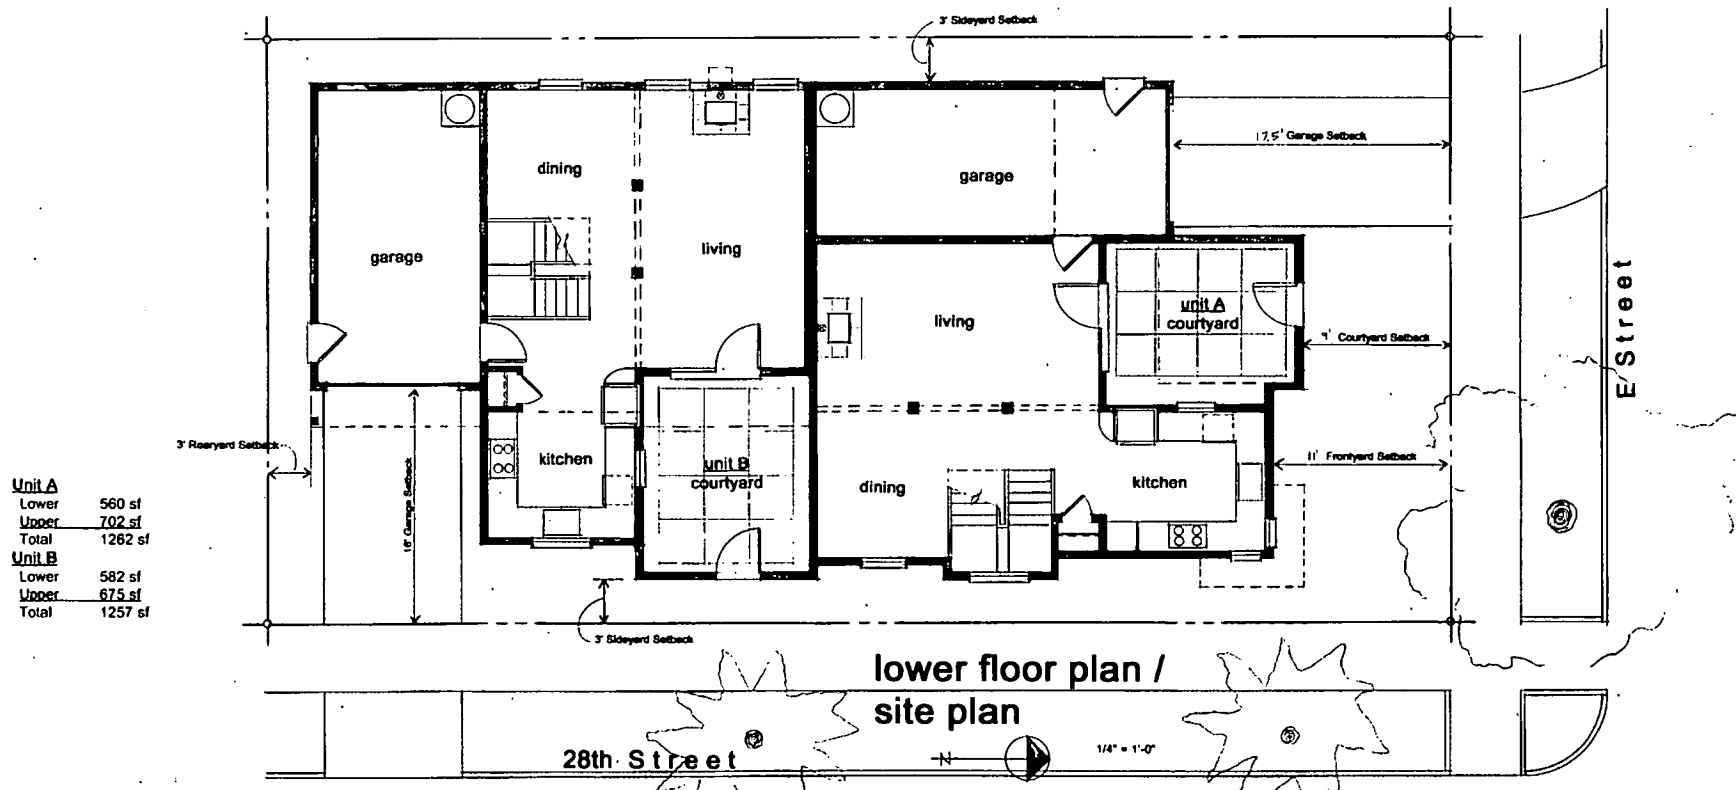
Site Plan/Floor Plan/Elevation Plan
